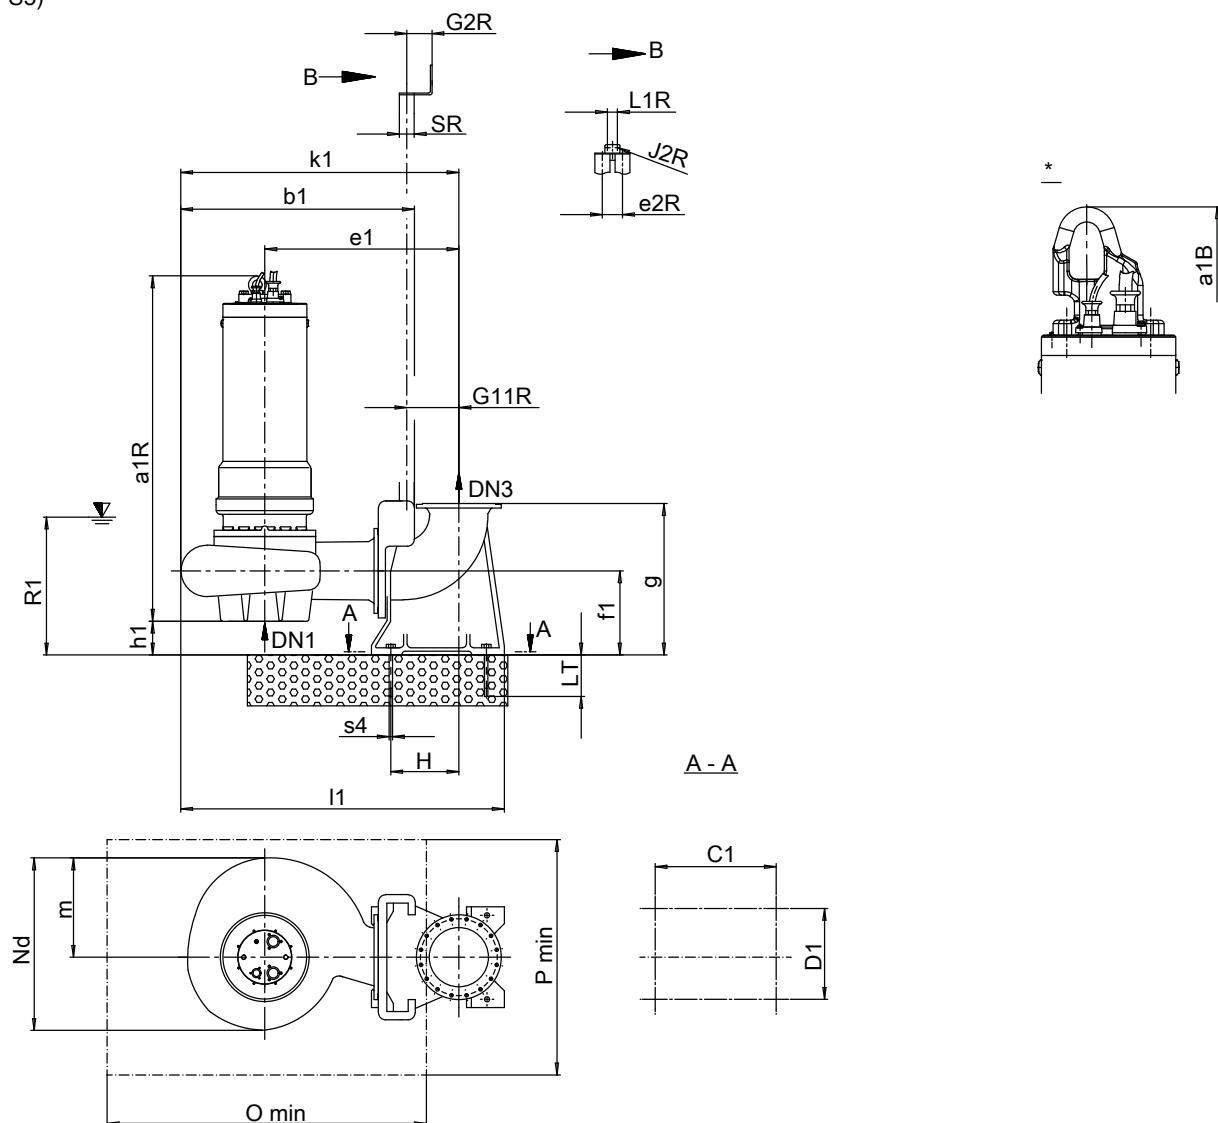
General arrangement drawing S5, stationary on duckfoot bend, guide rail arrangement, single-level foundation, without foundation rail, small upper holder, motor version N
